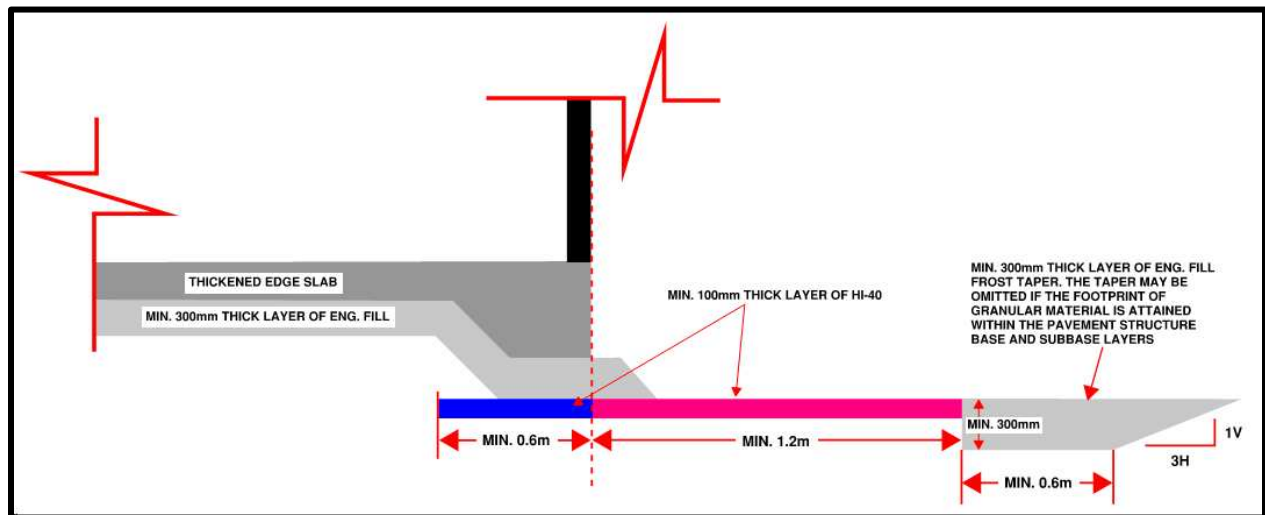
Proposed Thickened Edge Slab Foundation Insulation Detail
